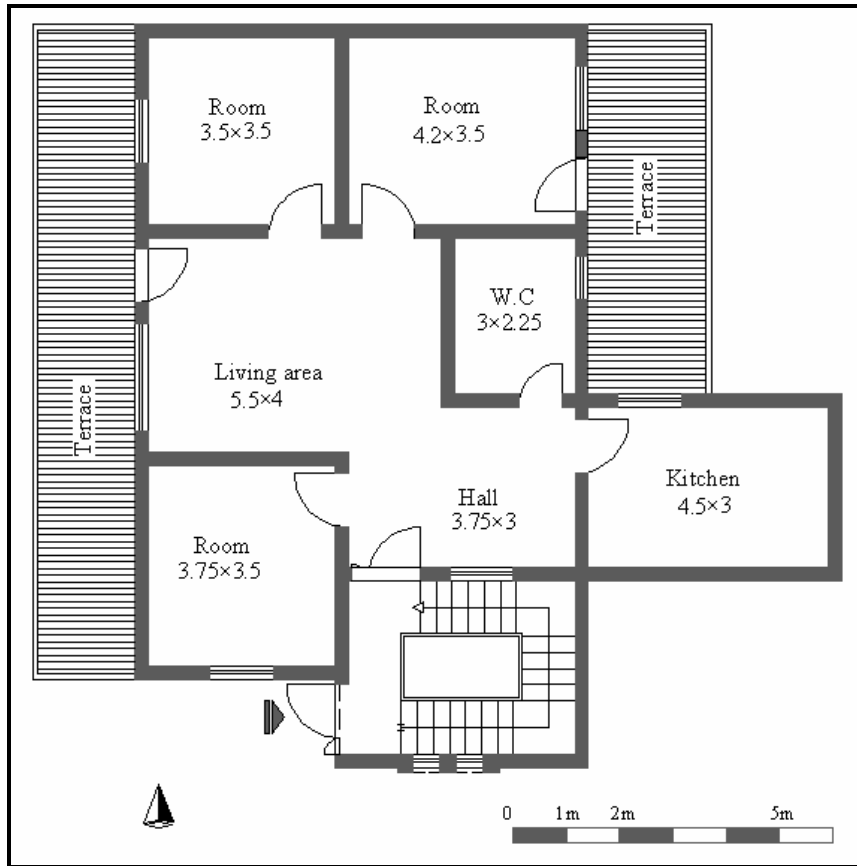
Typical layout of the contemporary house in Gharyan.
